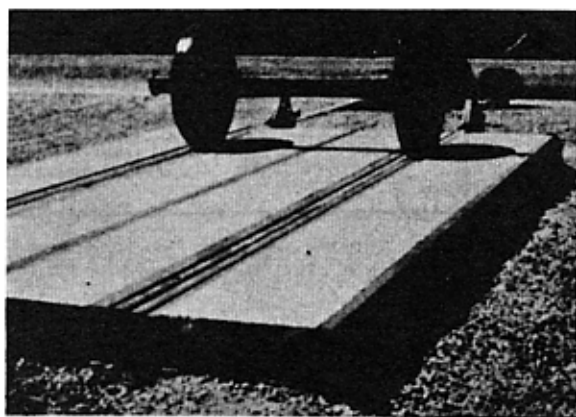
Precast concrete plank with rubber flangeway filler.
